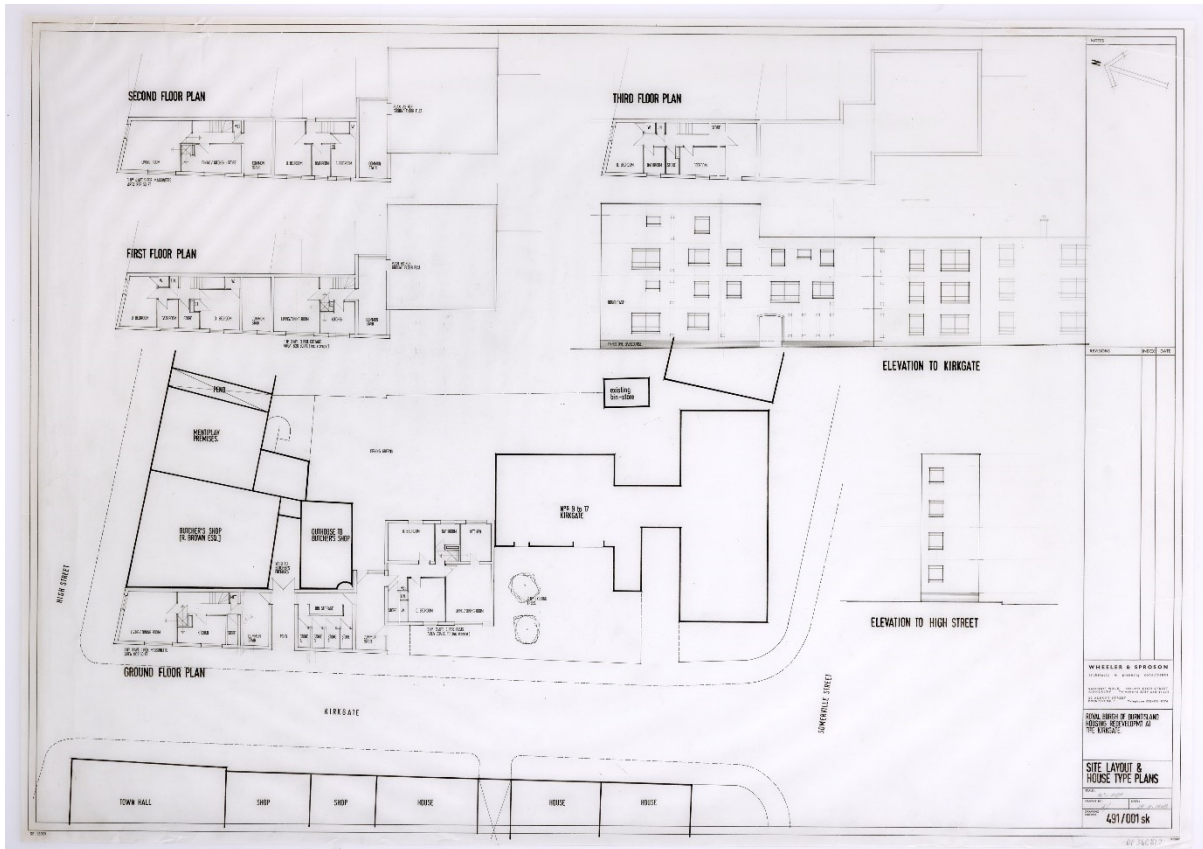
Site layout for Kirkgate/ High Street (Job 491) showing narrow corner block, November 1968.
